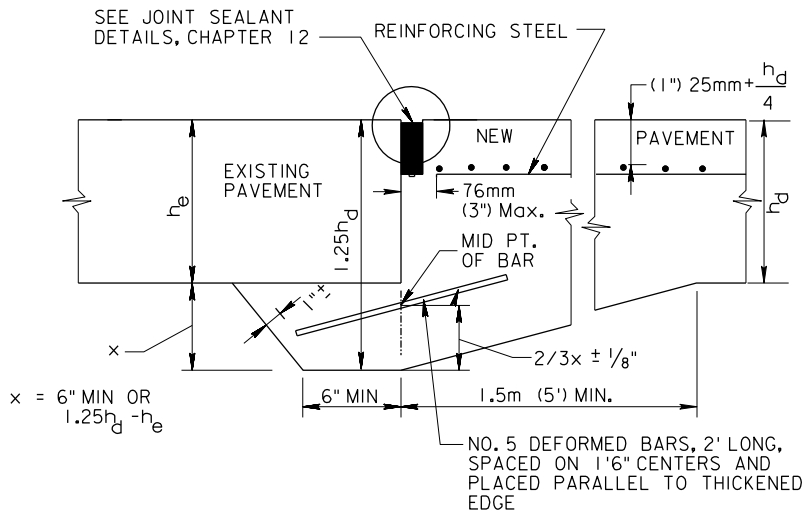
Construction Joints for Reinforced Pavements
